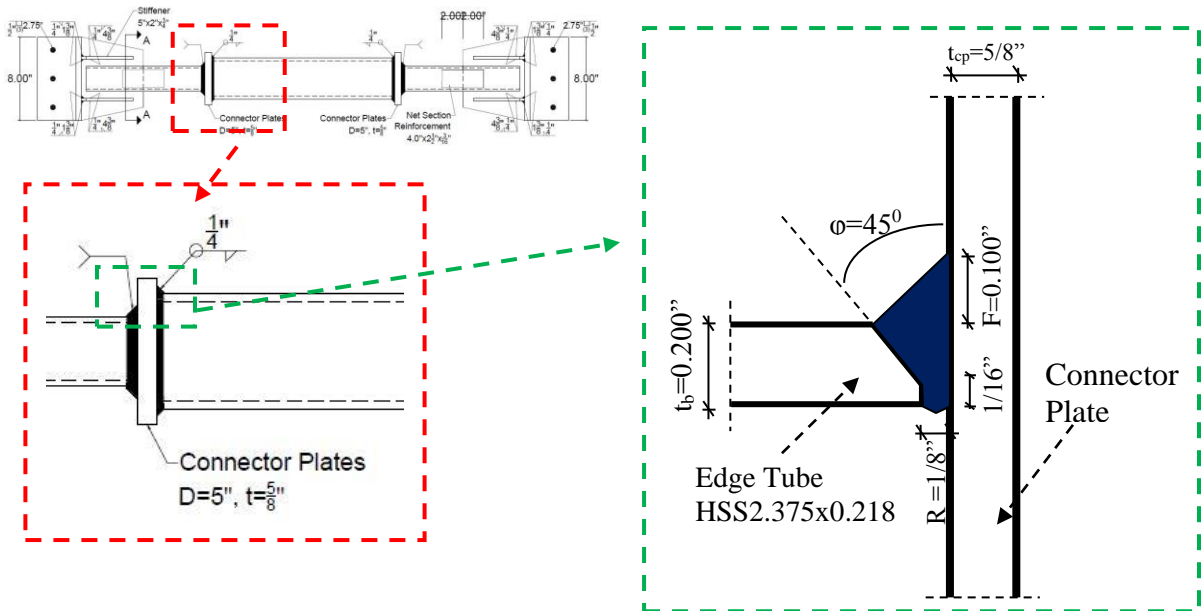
Welding detail of Specimen#2 (CJP) based on AWS D1.1 (2000)
